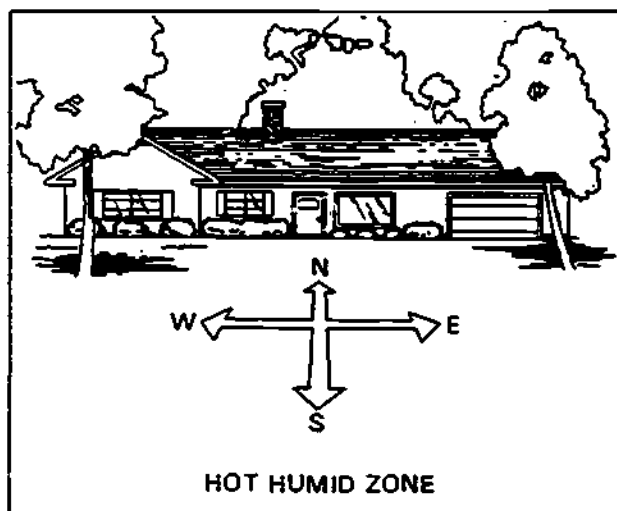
Buildings in the hot-humid zone should be oriented toward the north or south with ample shade for summer.
